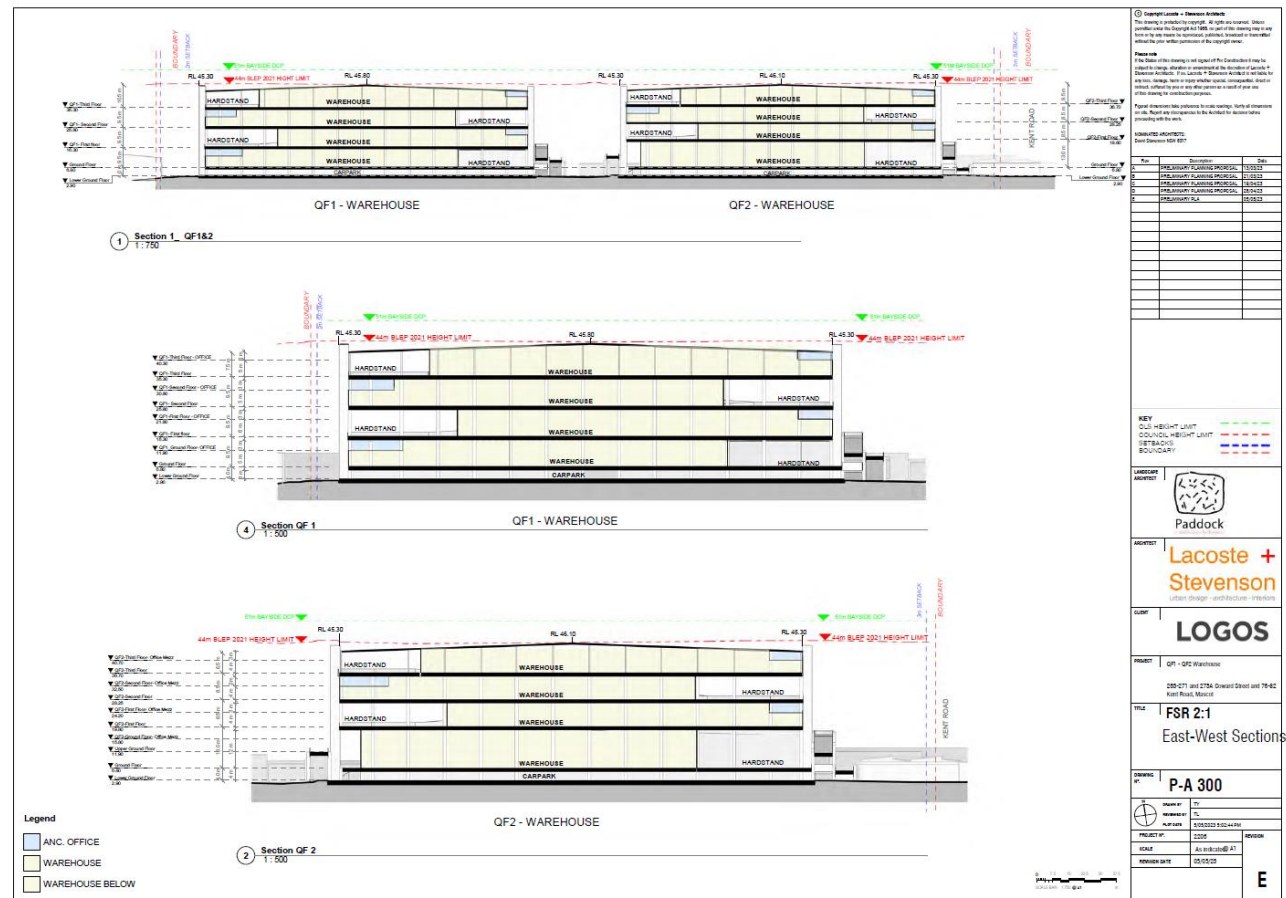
263-273 and 273A Coward Street and 76-82 Kent Street Mascot Site Section Drawing (Source: the Proponent)
